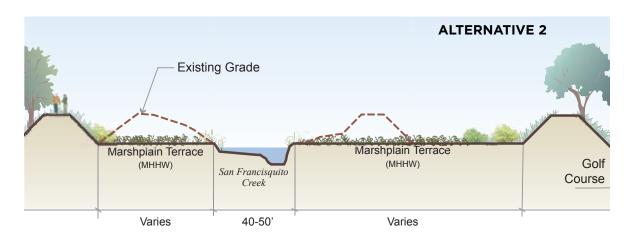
| CROSS SECTION C, VIEW LOOKING DOWNTREAM
